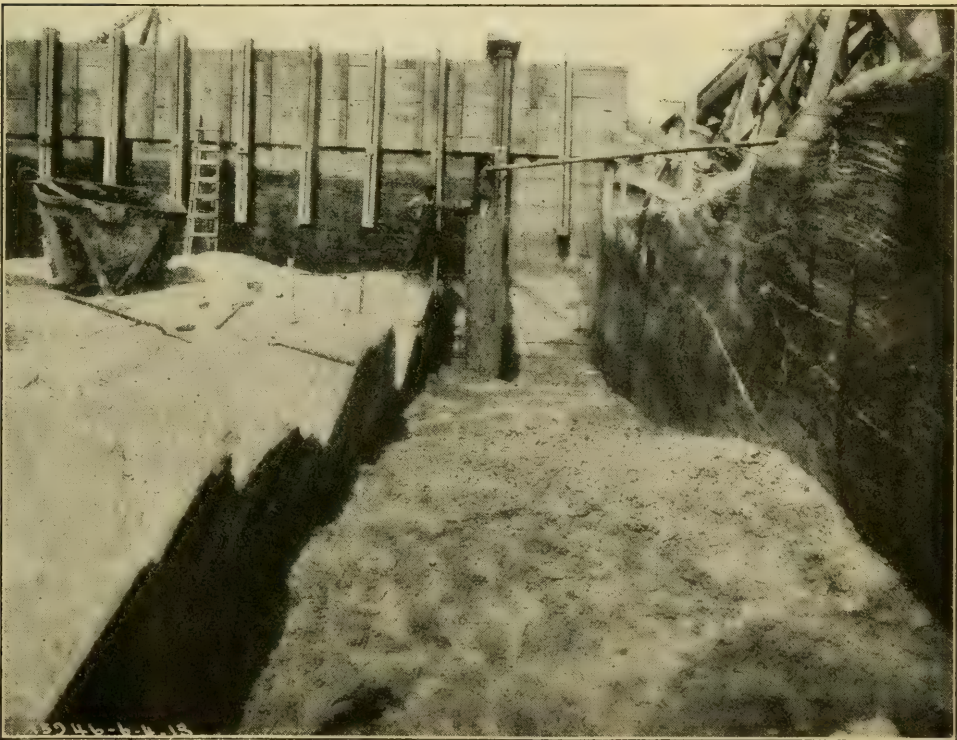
CUT-OFF TRENCH PARTLY FILLED WITH CONCRETE, SHOWING TYPE OF ROCK FOUNDATIONS.
